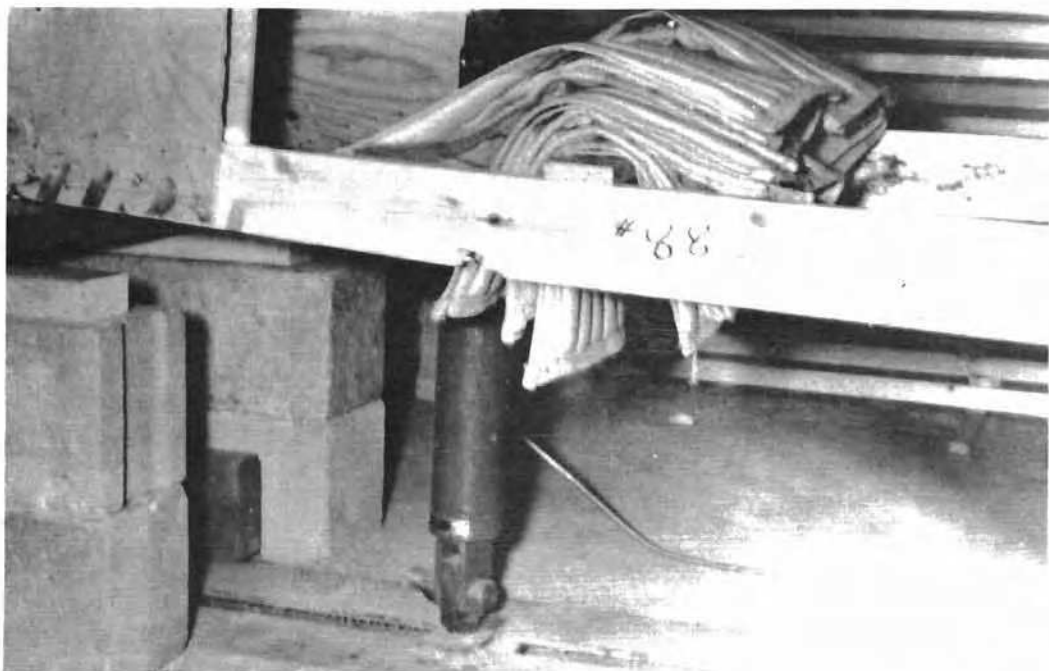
Failure caused by the lower chord breaking in tension near the heel joint.
